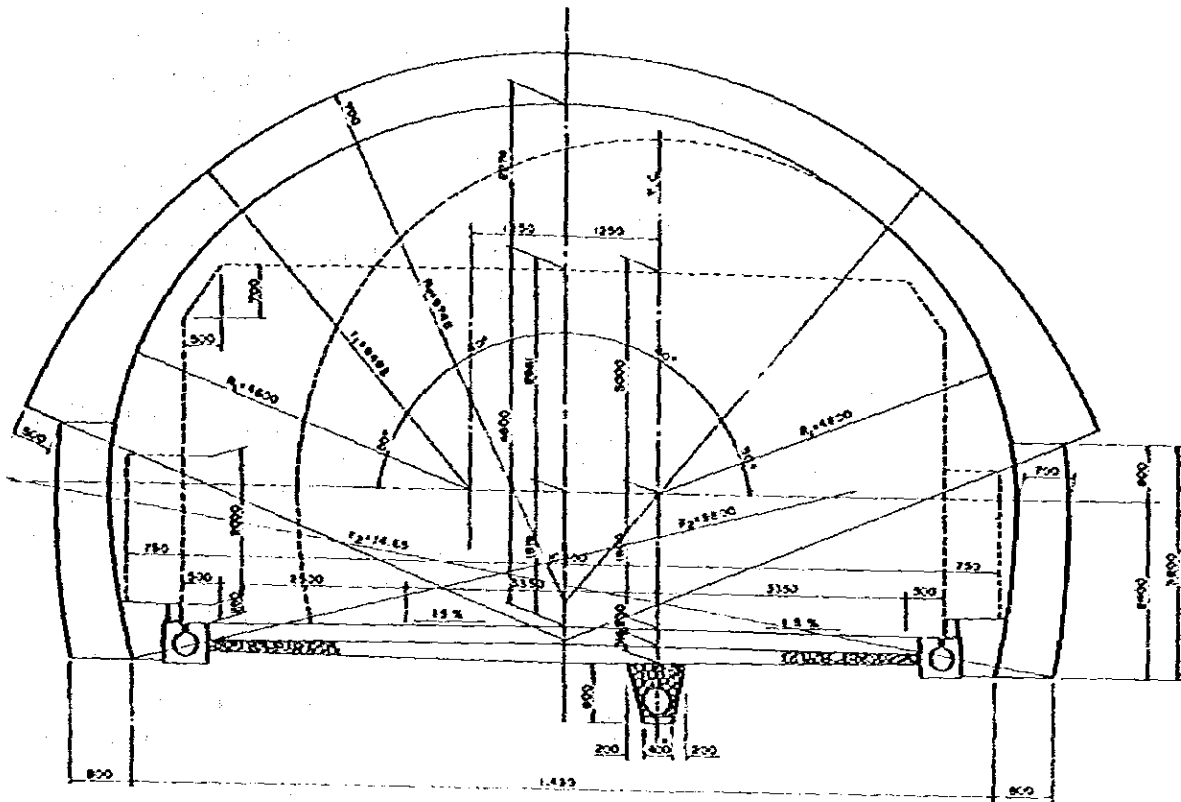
TYPICAL CROSS SECTION WITH EMERGENCY PARKING BAY
